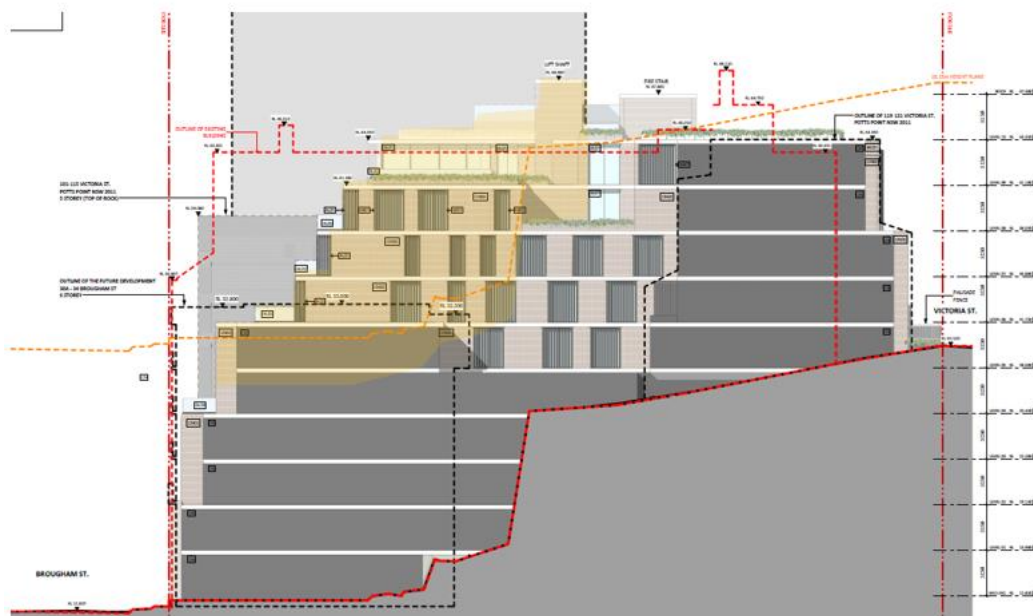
Excerpt of proposed southern elevation which shows building form which does not relate to the topography of the site (highlighted in yellow)
